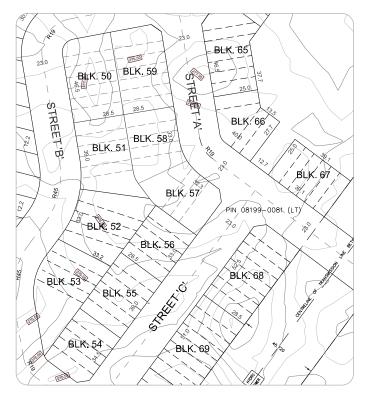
Proposed Street Townhouse Lots (Draft Plan Prepared by Weston Consulting)
